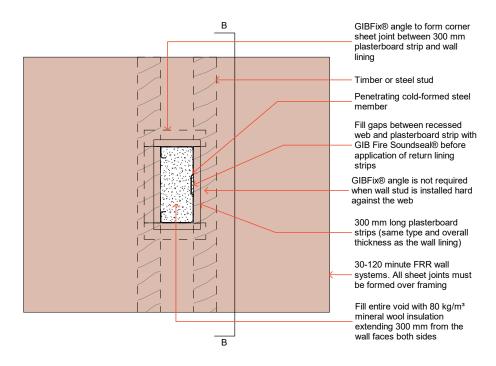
Cold-formed structural steel penetrating 30 - 120-minute FRR timber/steel frame wall systems
